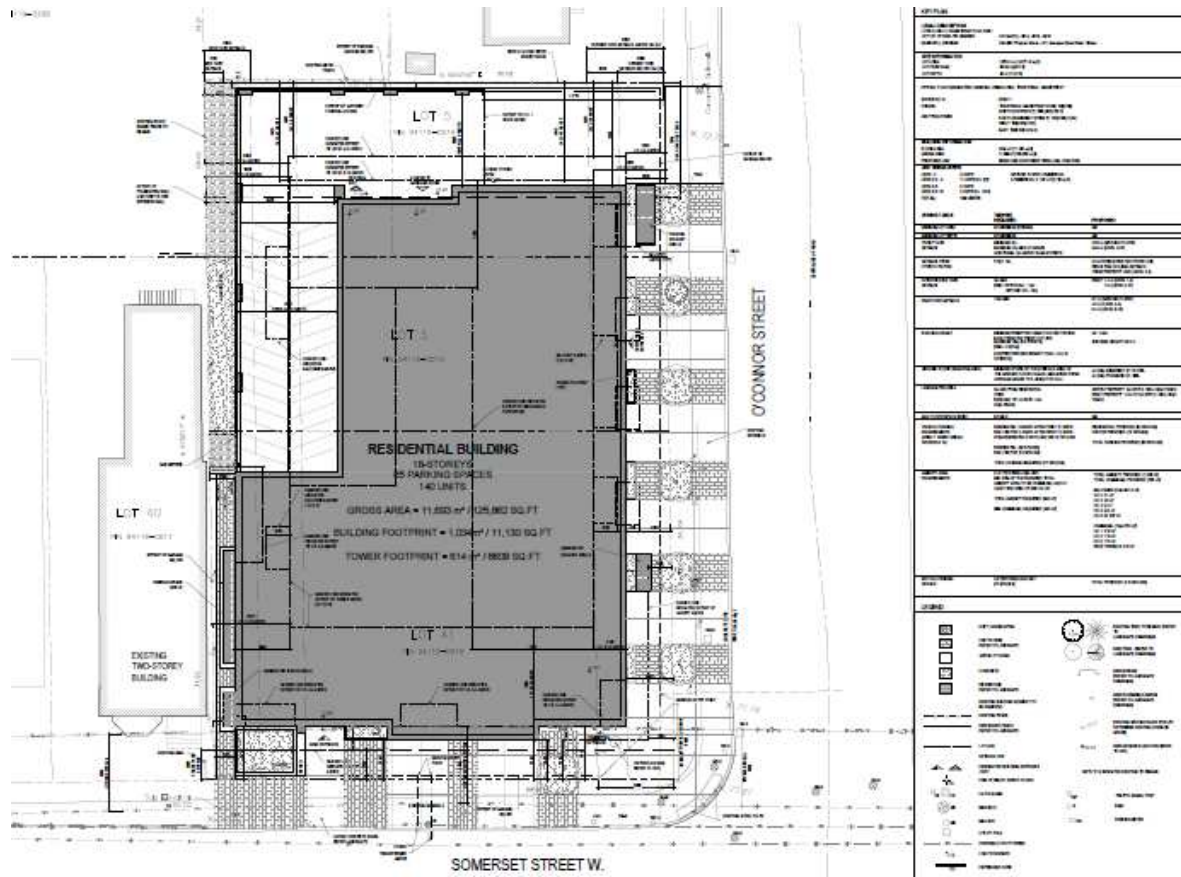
Site plan illustrating the paving treatment of the sidewalk with the front elevation of the Somerset facade set back in line with the existing houses. Source: Figurr Architects Collective.
